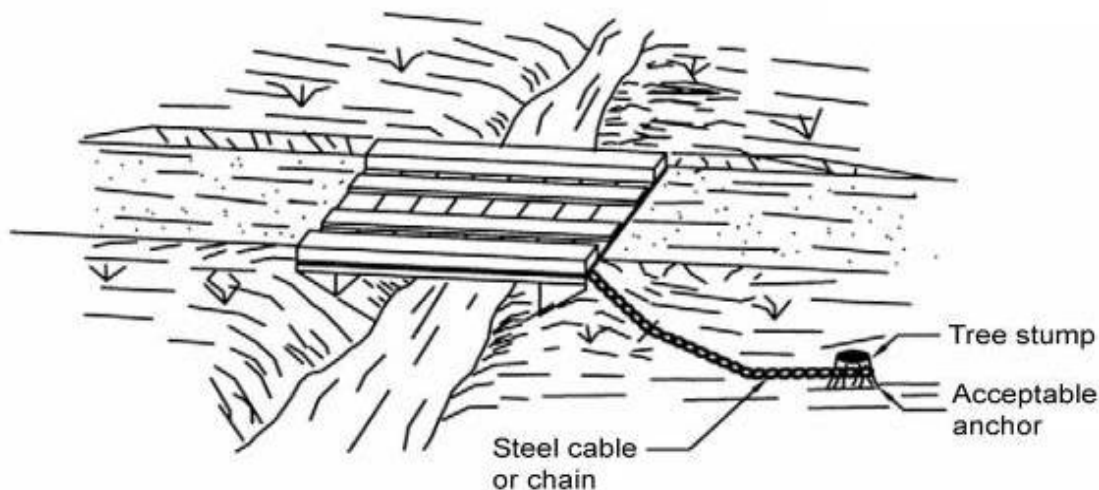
Temporary bridge example for small streams (with anchor to retain bridge components during floods)
